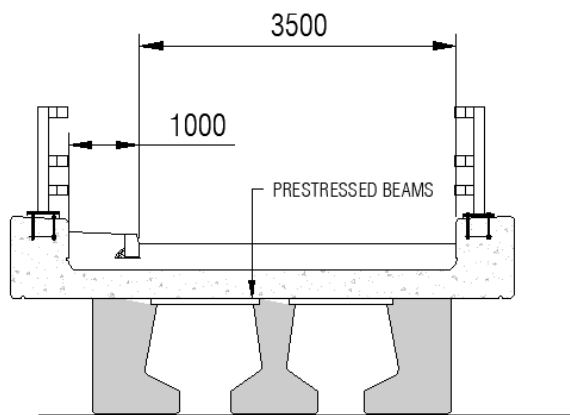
Typical Cross Section through 4b Prestressed Beam Bridge
